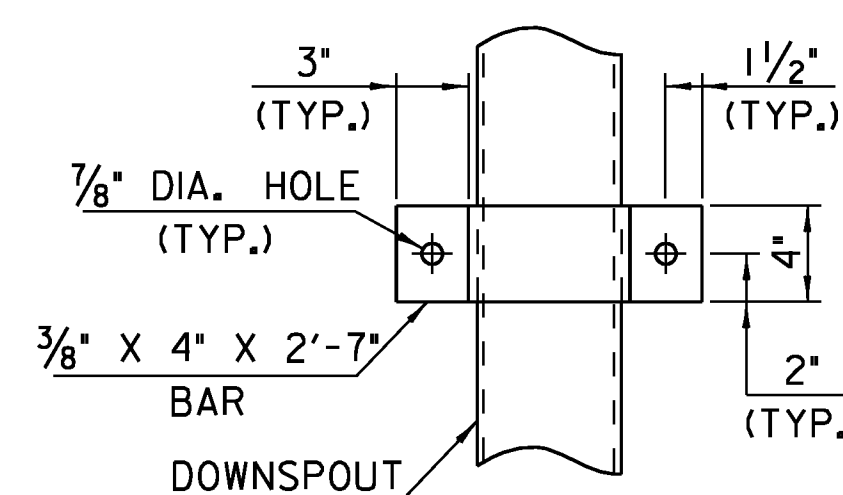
DETAILS FOR ATTACHING DOWNSPOUT TO ABUTMENT
